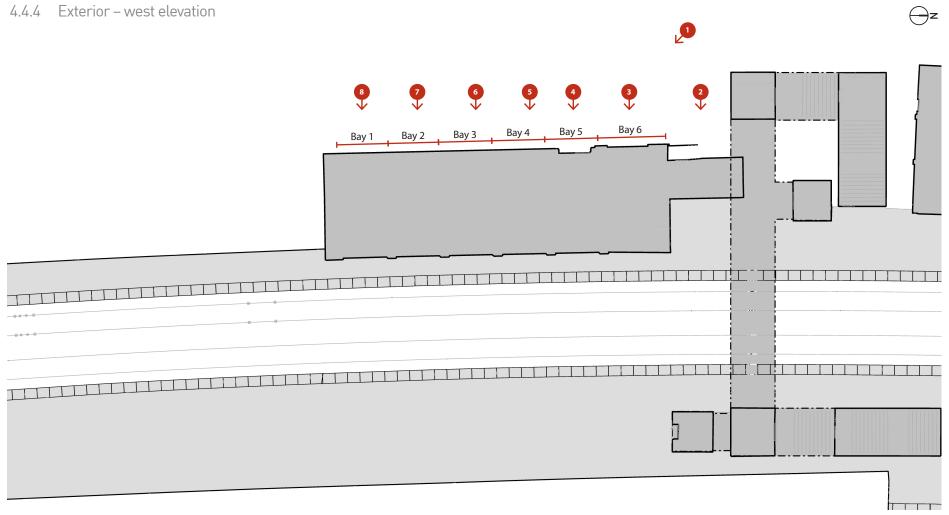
Key plan showing location and direction of photos of the exterior west elevation of Good Shed
